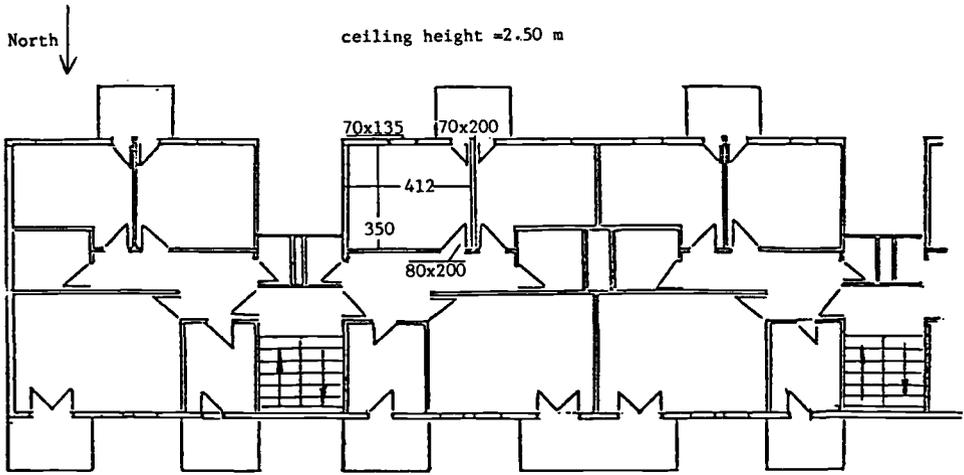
Floor plan of the four-story apartment building constructed by the cell unit system in the second site.
